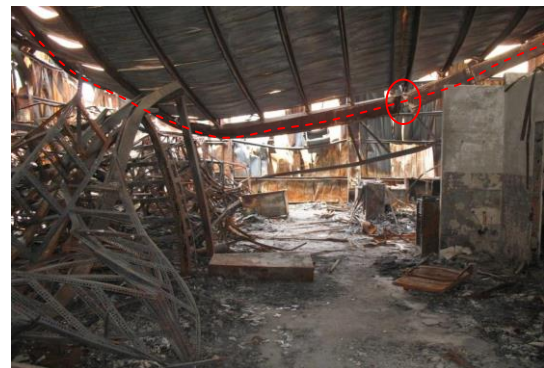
Broken bolts at the joint of roof steel beams from a metal house fire incident.
